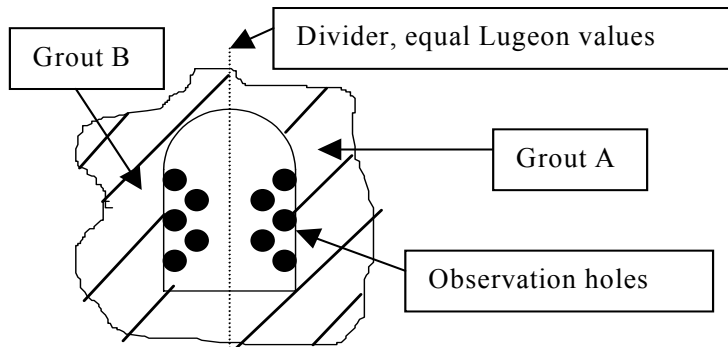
Principal layout of trial fan at South Link, Stockholm The fan is divided into equal Lugeon sums and corresponding observation holes are shown, Dalmalm et al (2000).
